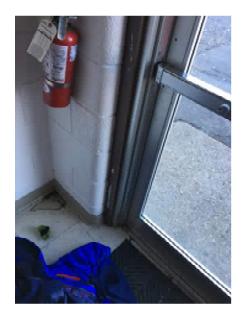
VCT flooring at 1954 building corridor. Flooring in poor condition further to east end of hallway and should be replaced. (Priority 1)
